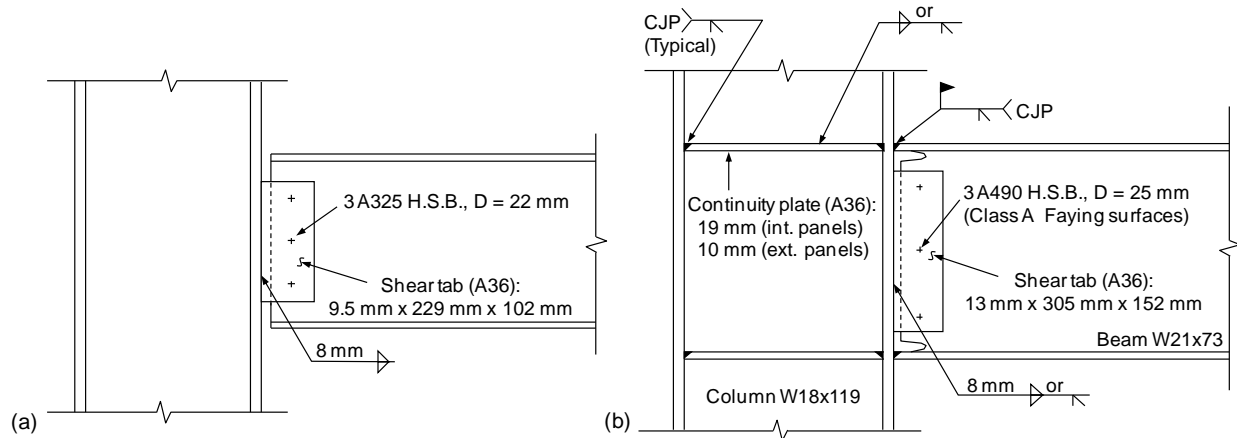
Details of bolted connections: (a) single-plate shear connection; (b) WUF-B moment connection.
